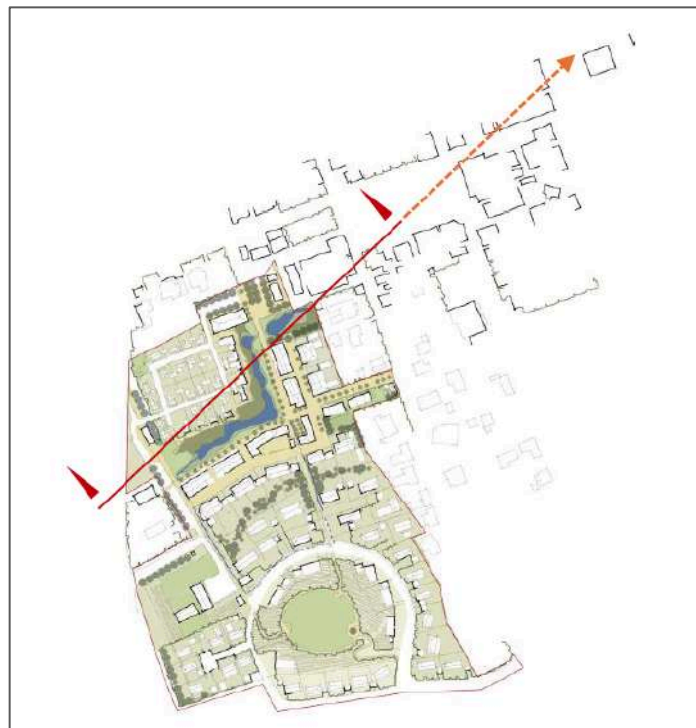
Section DD from the indicated position on Church Street (R311) over the proposed development towards the Church in Main Road
